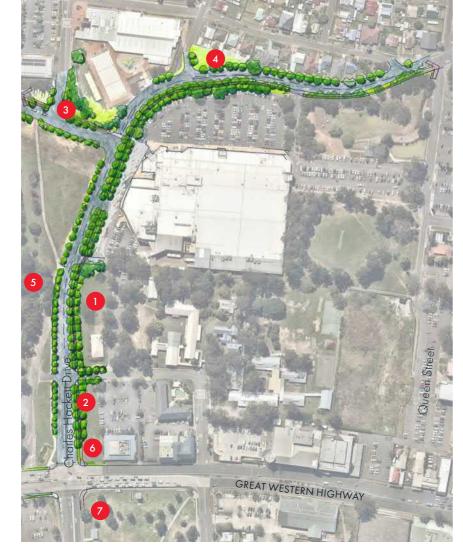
Concept plan - Charles Hackett Drive shared path connection to Queen Street.
